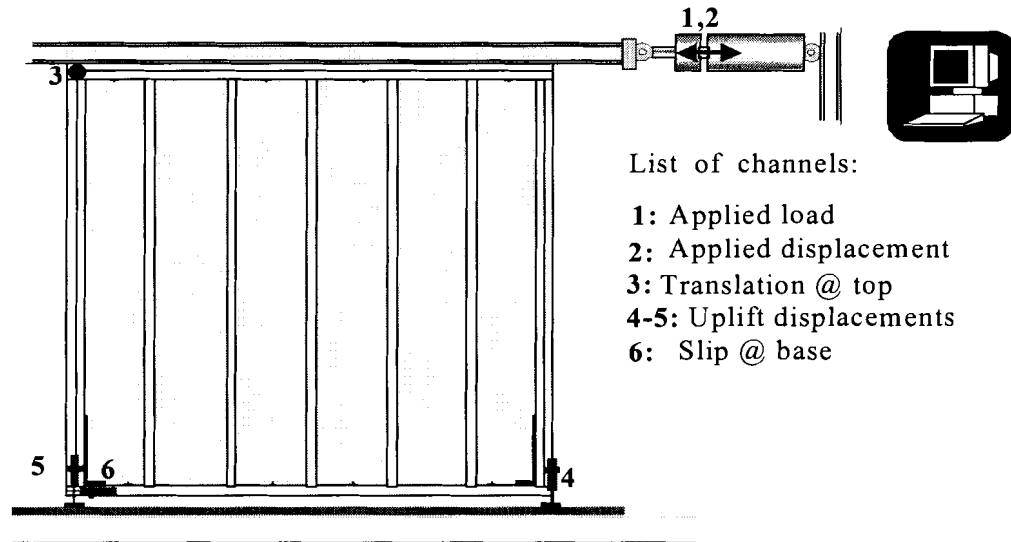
Instrumentation of Shear Wall Test Specimen.
